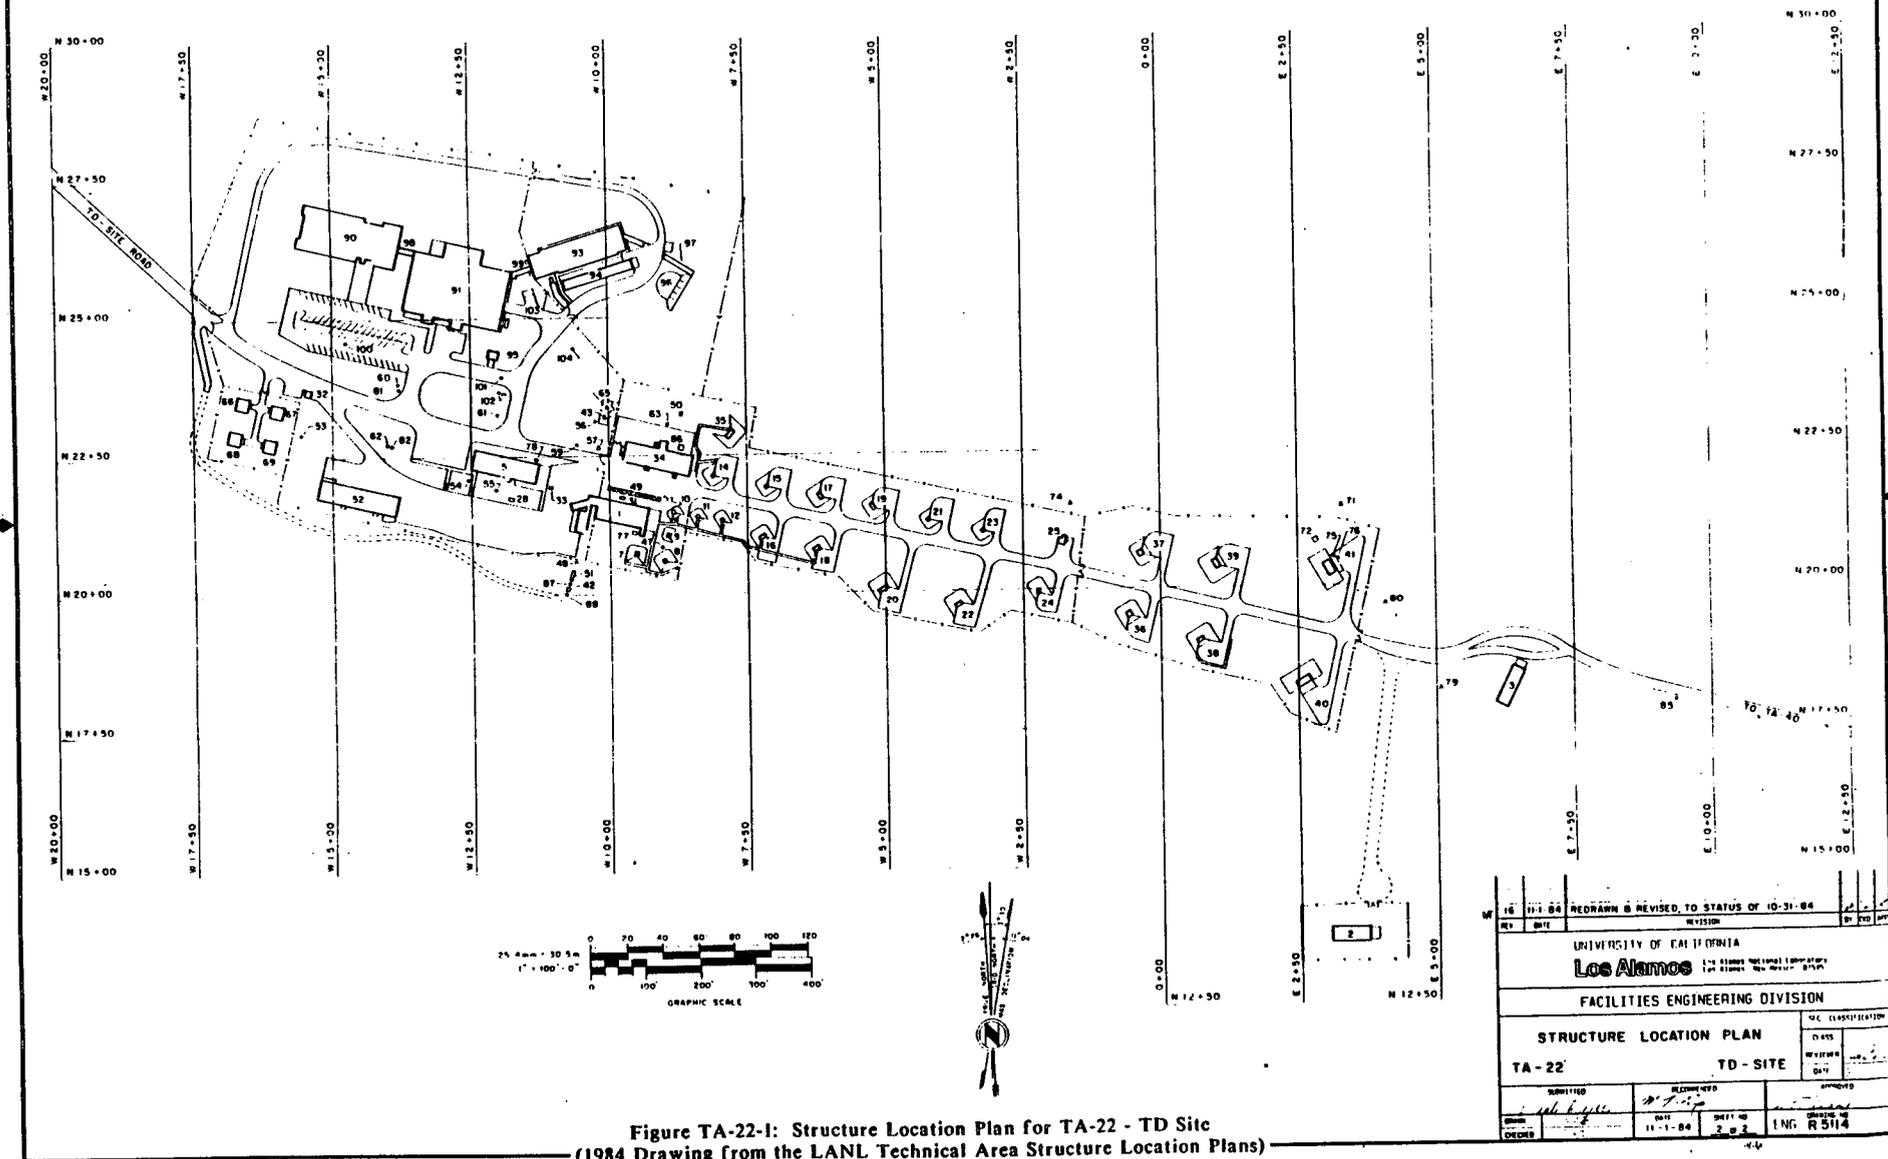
Structure Location Plan for TA-22 - TD Site
